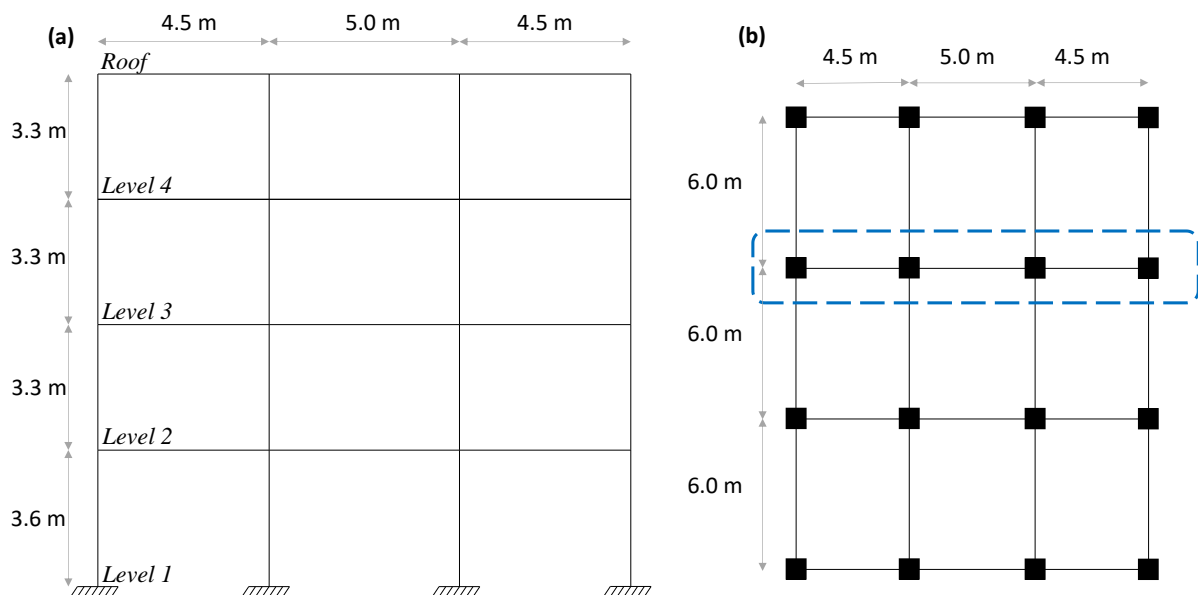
a) Elevation view of the designed RC frame, b) Plan view of the building with the internal frame highlighted
